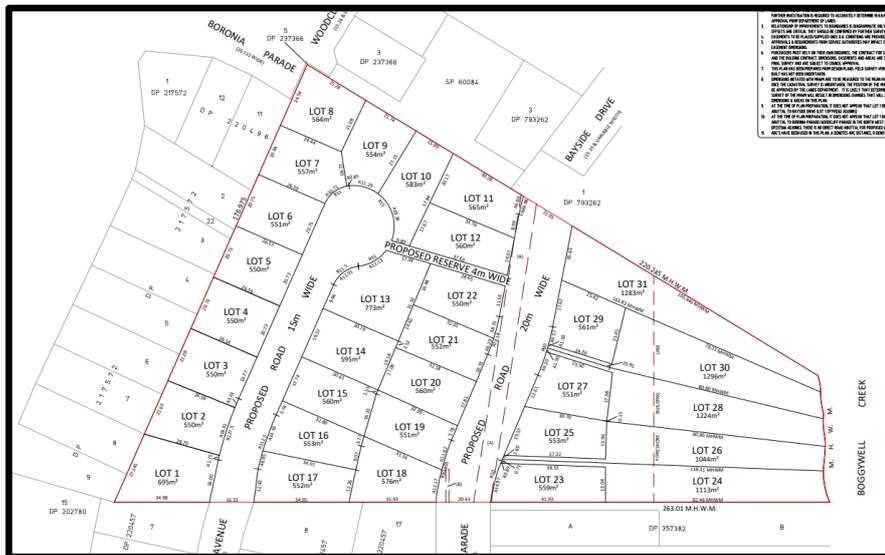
Extract of the proposed subdivision plan showing the proposed new allotments across the Site (courtesy: Bevridge Williams dated 26 April 2021)
